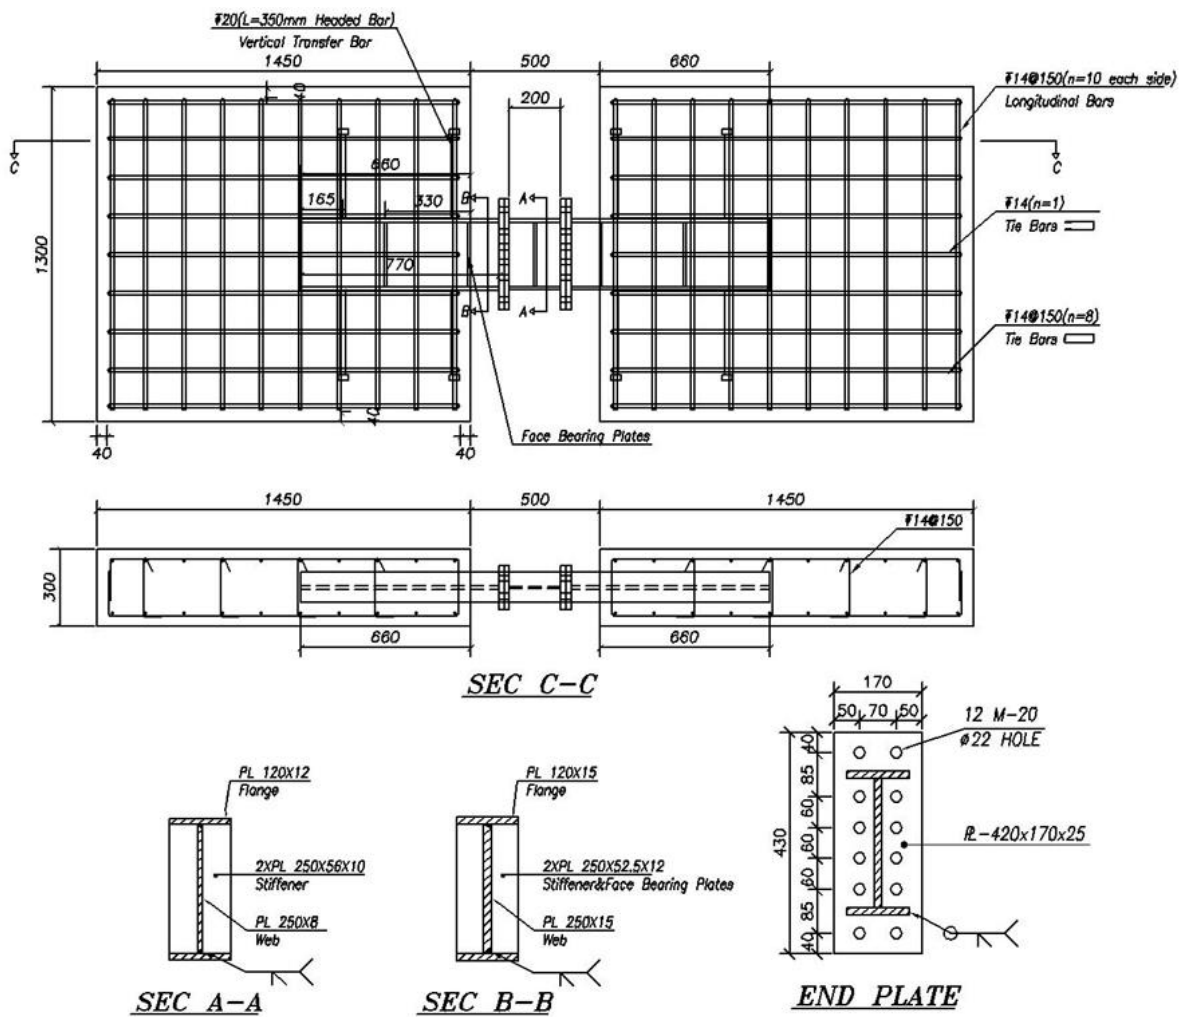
Parts of RC Shear Wall and Coupling Beam with Fuse Element
